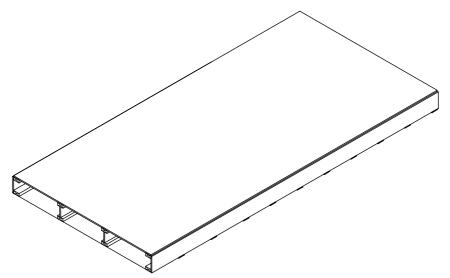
Roofing cassette where insulation can be dried out if high moisture levels are detected
